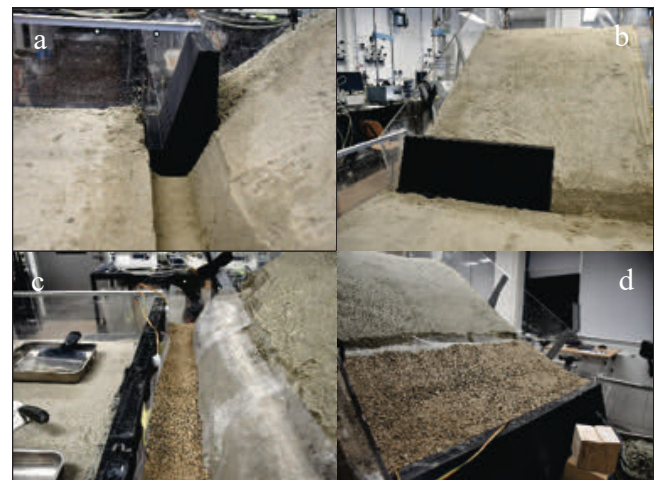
Installation of gravity wall and buttressing embankment behind the wall in prepared sandy slope: a) excavated foundation pit and installed element of the gravity wall, b) a view at the partially installed wall in the foot of the slope, c) filling the gravel material behind the wall with installed sensors; geotextile is laid to the steps in the sandy slope; d) filled buttressing embankment behind the gravity wall along the slope.
